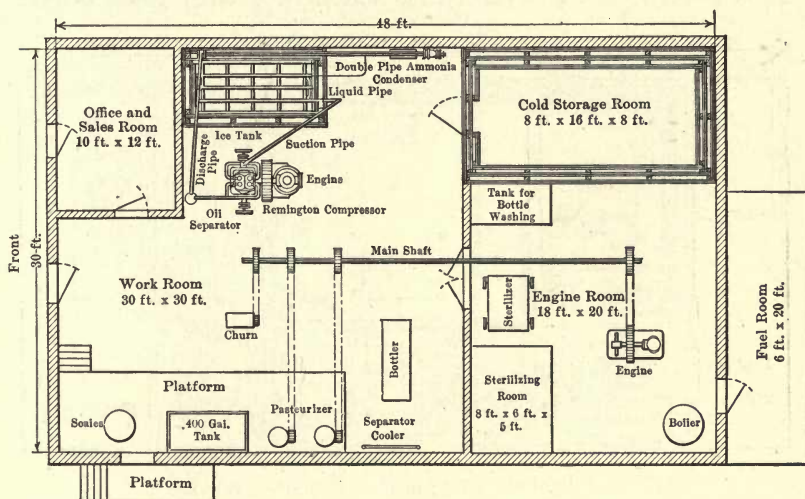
Complete Dairy Plant, 30'X48'. Remington Machine Co.
